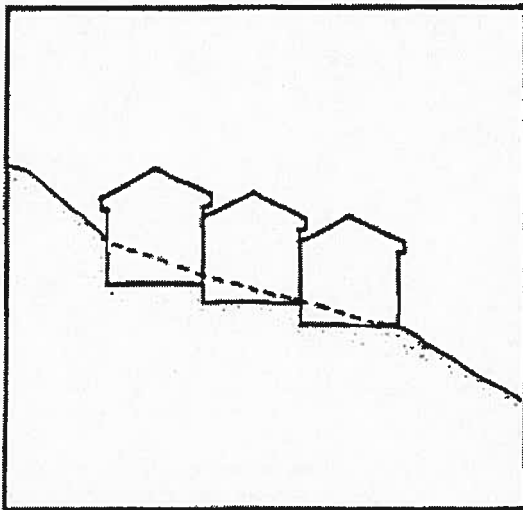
Site building into hillsides to incorporate them (blend-in) visually into existing hillside. Place buildings below ridge line in order to preserve natural setting.
